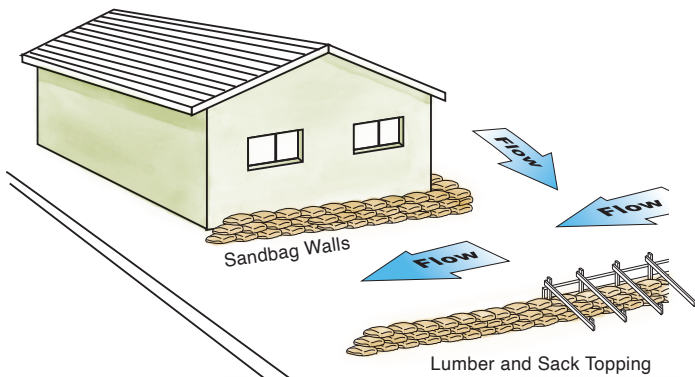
To divert mud, debris, and water, use sandbag walls or lumber and sack topping
